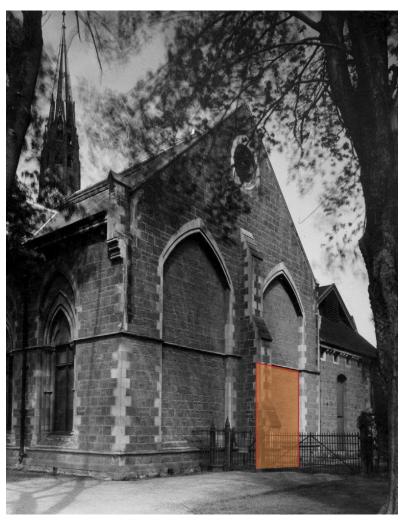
1877 Mountfort Building, north wall pre-1958. The only connection between this façade and any other construction will be the perimeter of the new opening shown in orange. (original image source: Canterbury Museum archives)
